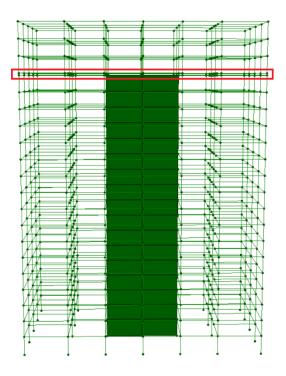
Controlled building with shear wall when isolator at 17th floor
